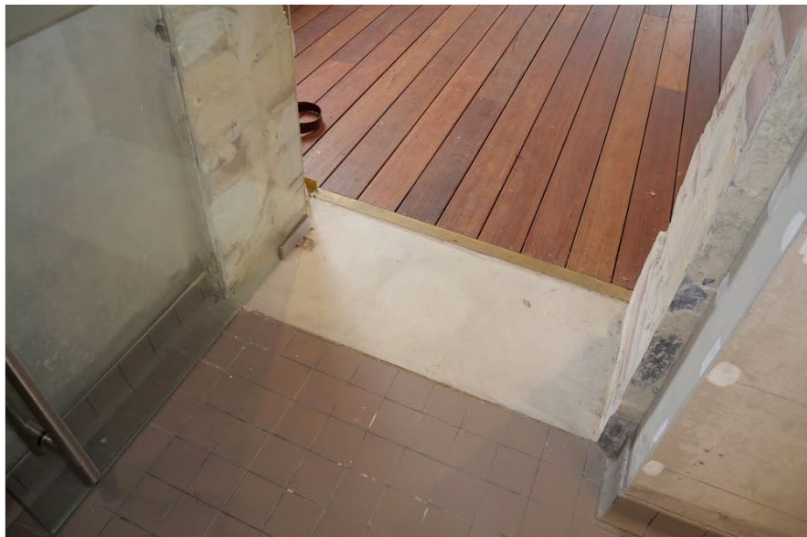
View of the modern door opening cut through the original sandstone walls and modern concrete threshold between the original building and the new kitchen wing to the west.
